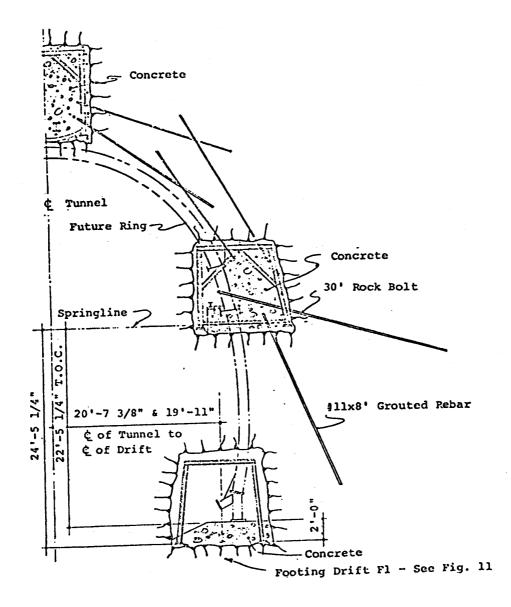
Zone II – Five Drifts and Rock Reinforcement Sta. 85+60 to 100+30.
